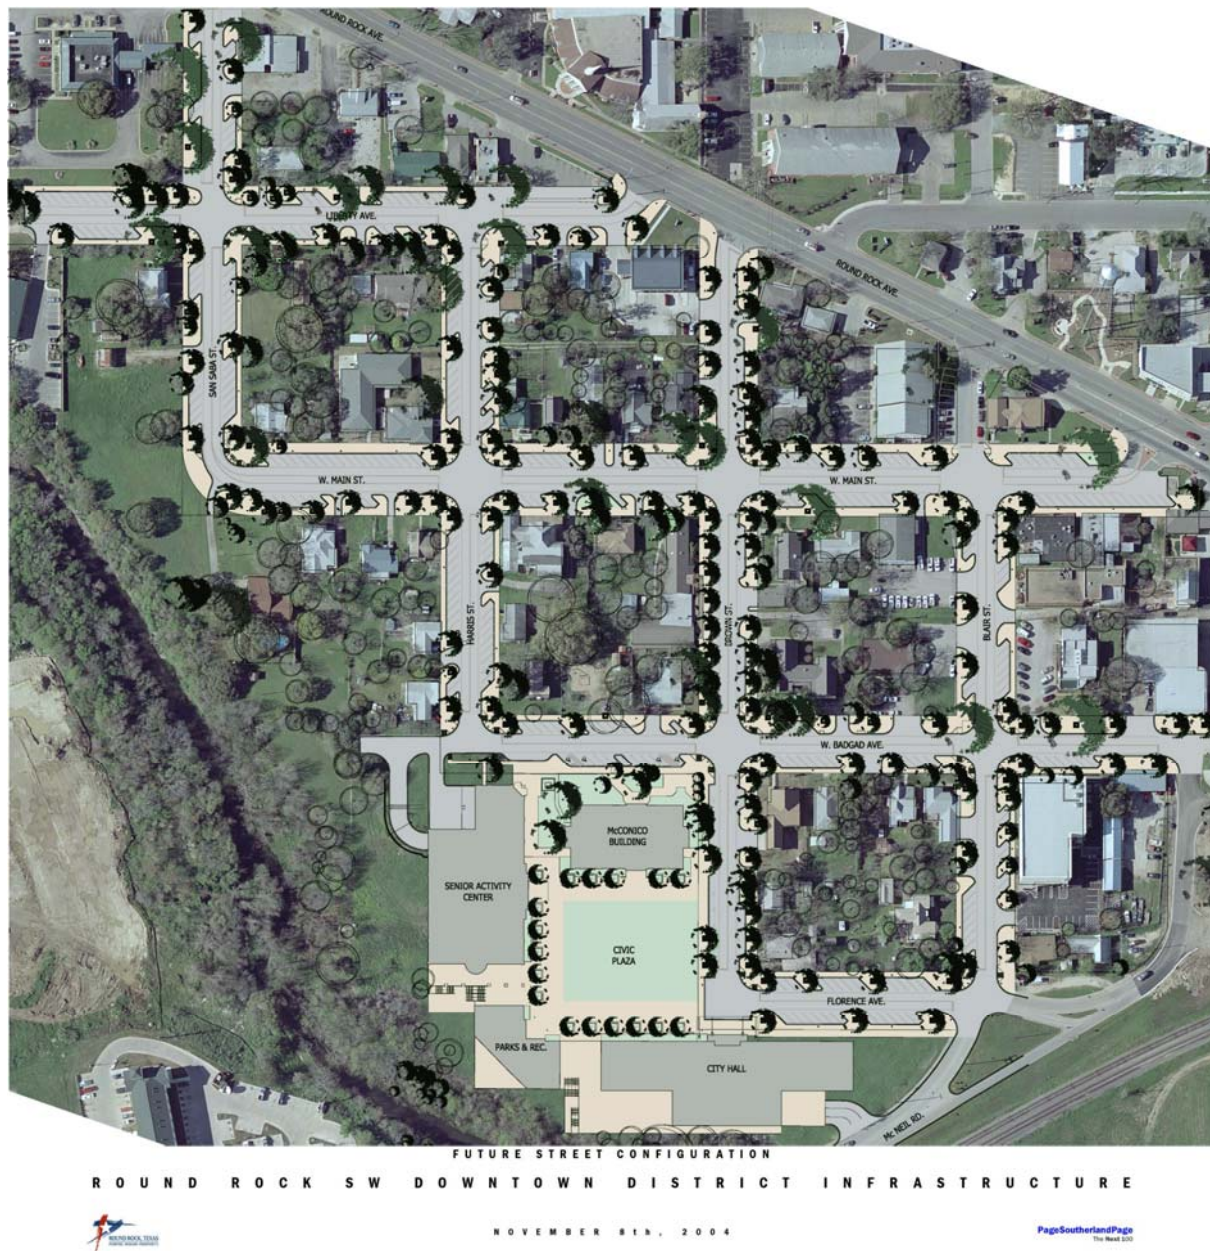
Southwest Downtown Street Improvement Plan. The street improvements are part of an overall infrastructure improvement plan that was approved in a City bond election. Objectives of the street improvements are to complete curbs and gutters to improve drainage, increase the number of on-street parking spaces, complete the sidewalks and improve their appearance, and to preserve the Plan Area's many large trees and incorporate them into a street tree plan along with new trees. Tree roots and utility placement may warrant minor modifications of the Street Improvement Plan. *Illustration: PageSouthernlandPage.
